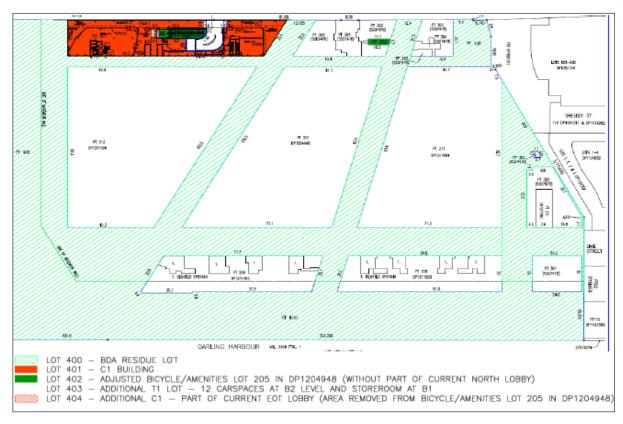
| Ground Level (south) showing proposed Lot 401 (red shading, proposed Lot 402 (green shading), proposed Lot 404 (red hatching) and proposed Lot 400 (green hatching) (Source: Applicant)
